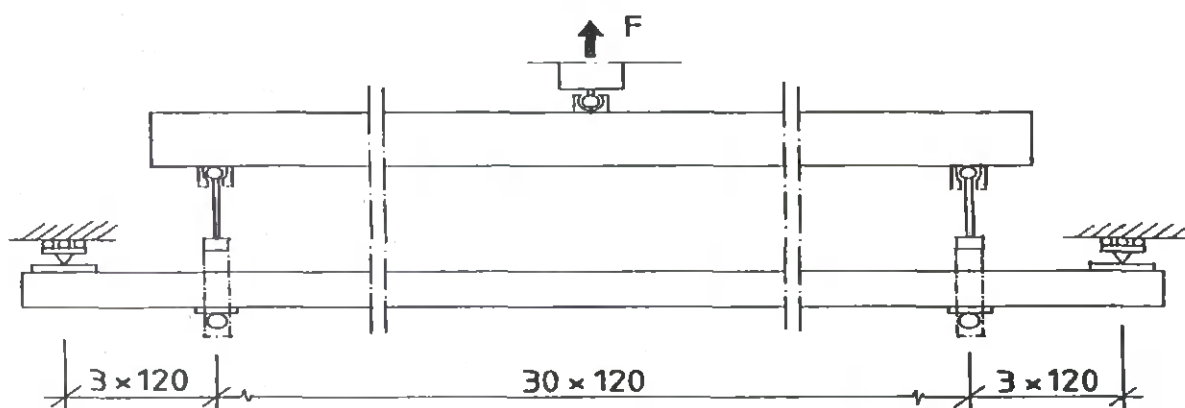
Principal test arrangement when timber members containing many weak zones were tested. All sizes in mm.
